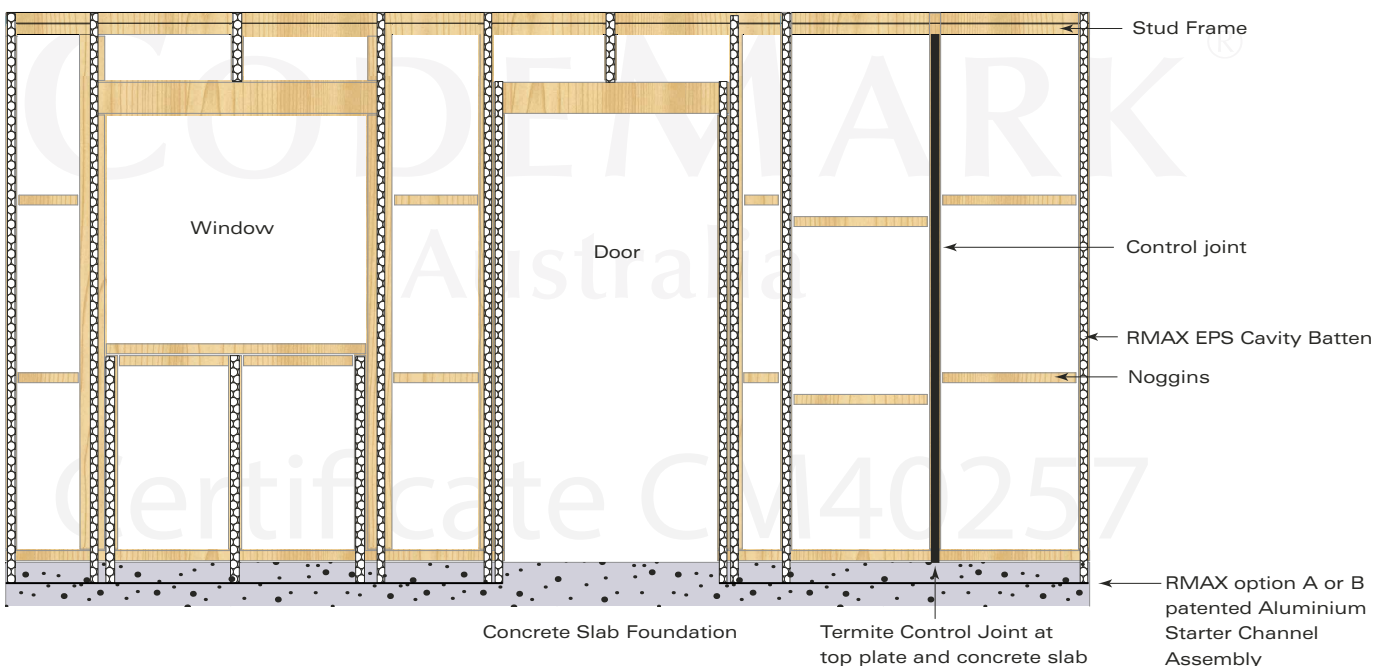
Installation of RMAX Ultra EPS Cavity Battens to Stud Frame
